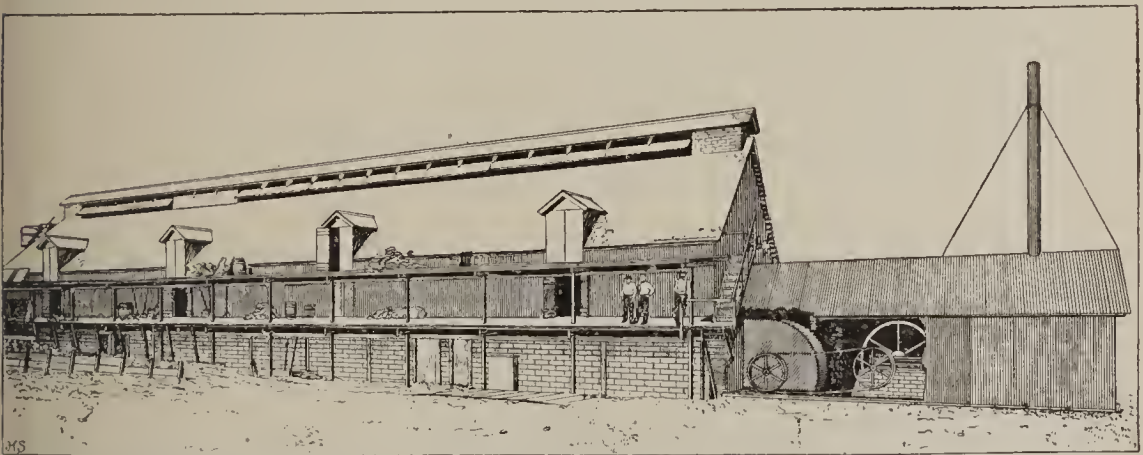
Perspective of air-blast kiln the plans of which are shown in figures 10, 11, and 12.
